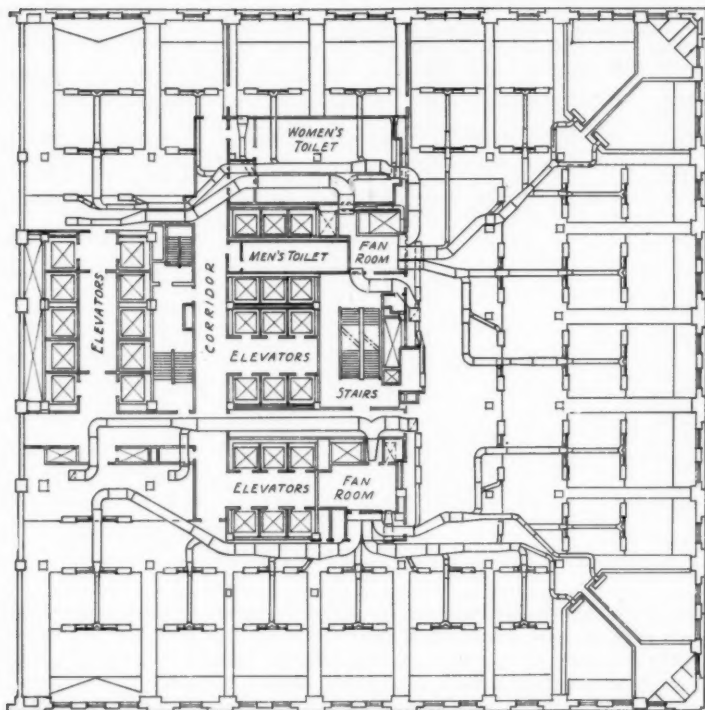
FLOOR PLAN SHOWING TYPICAL DUCT LAYOUT
